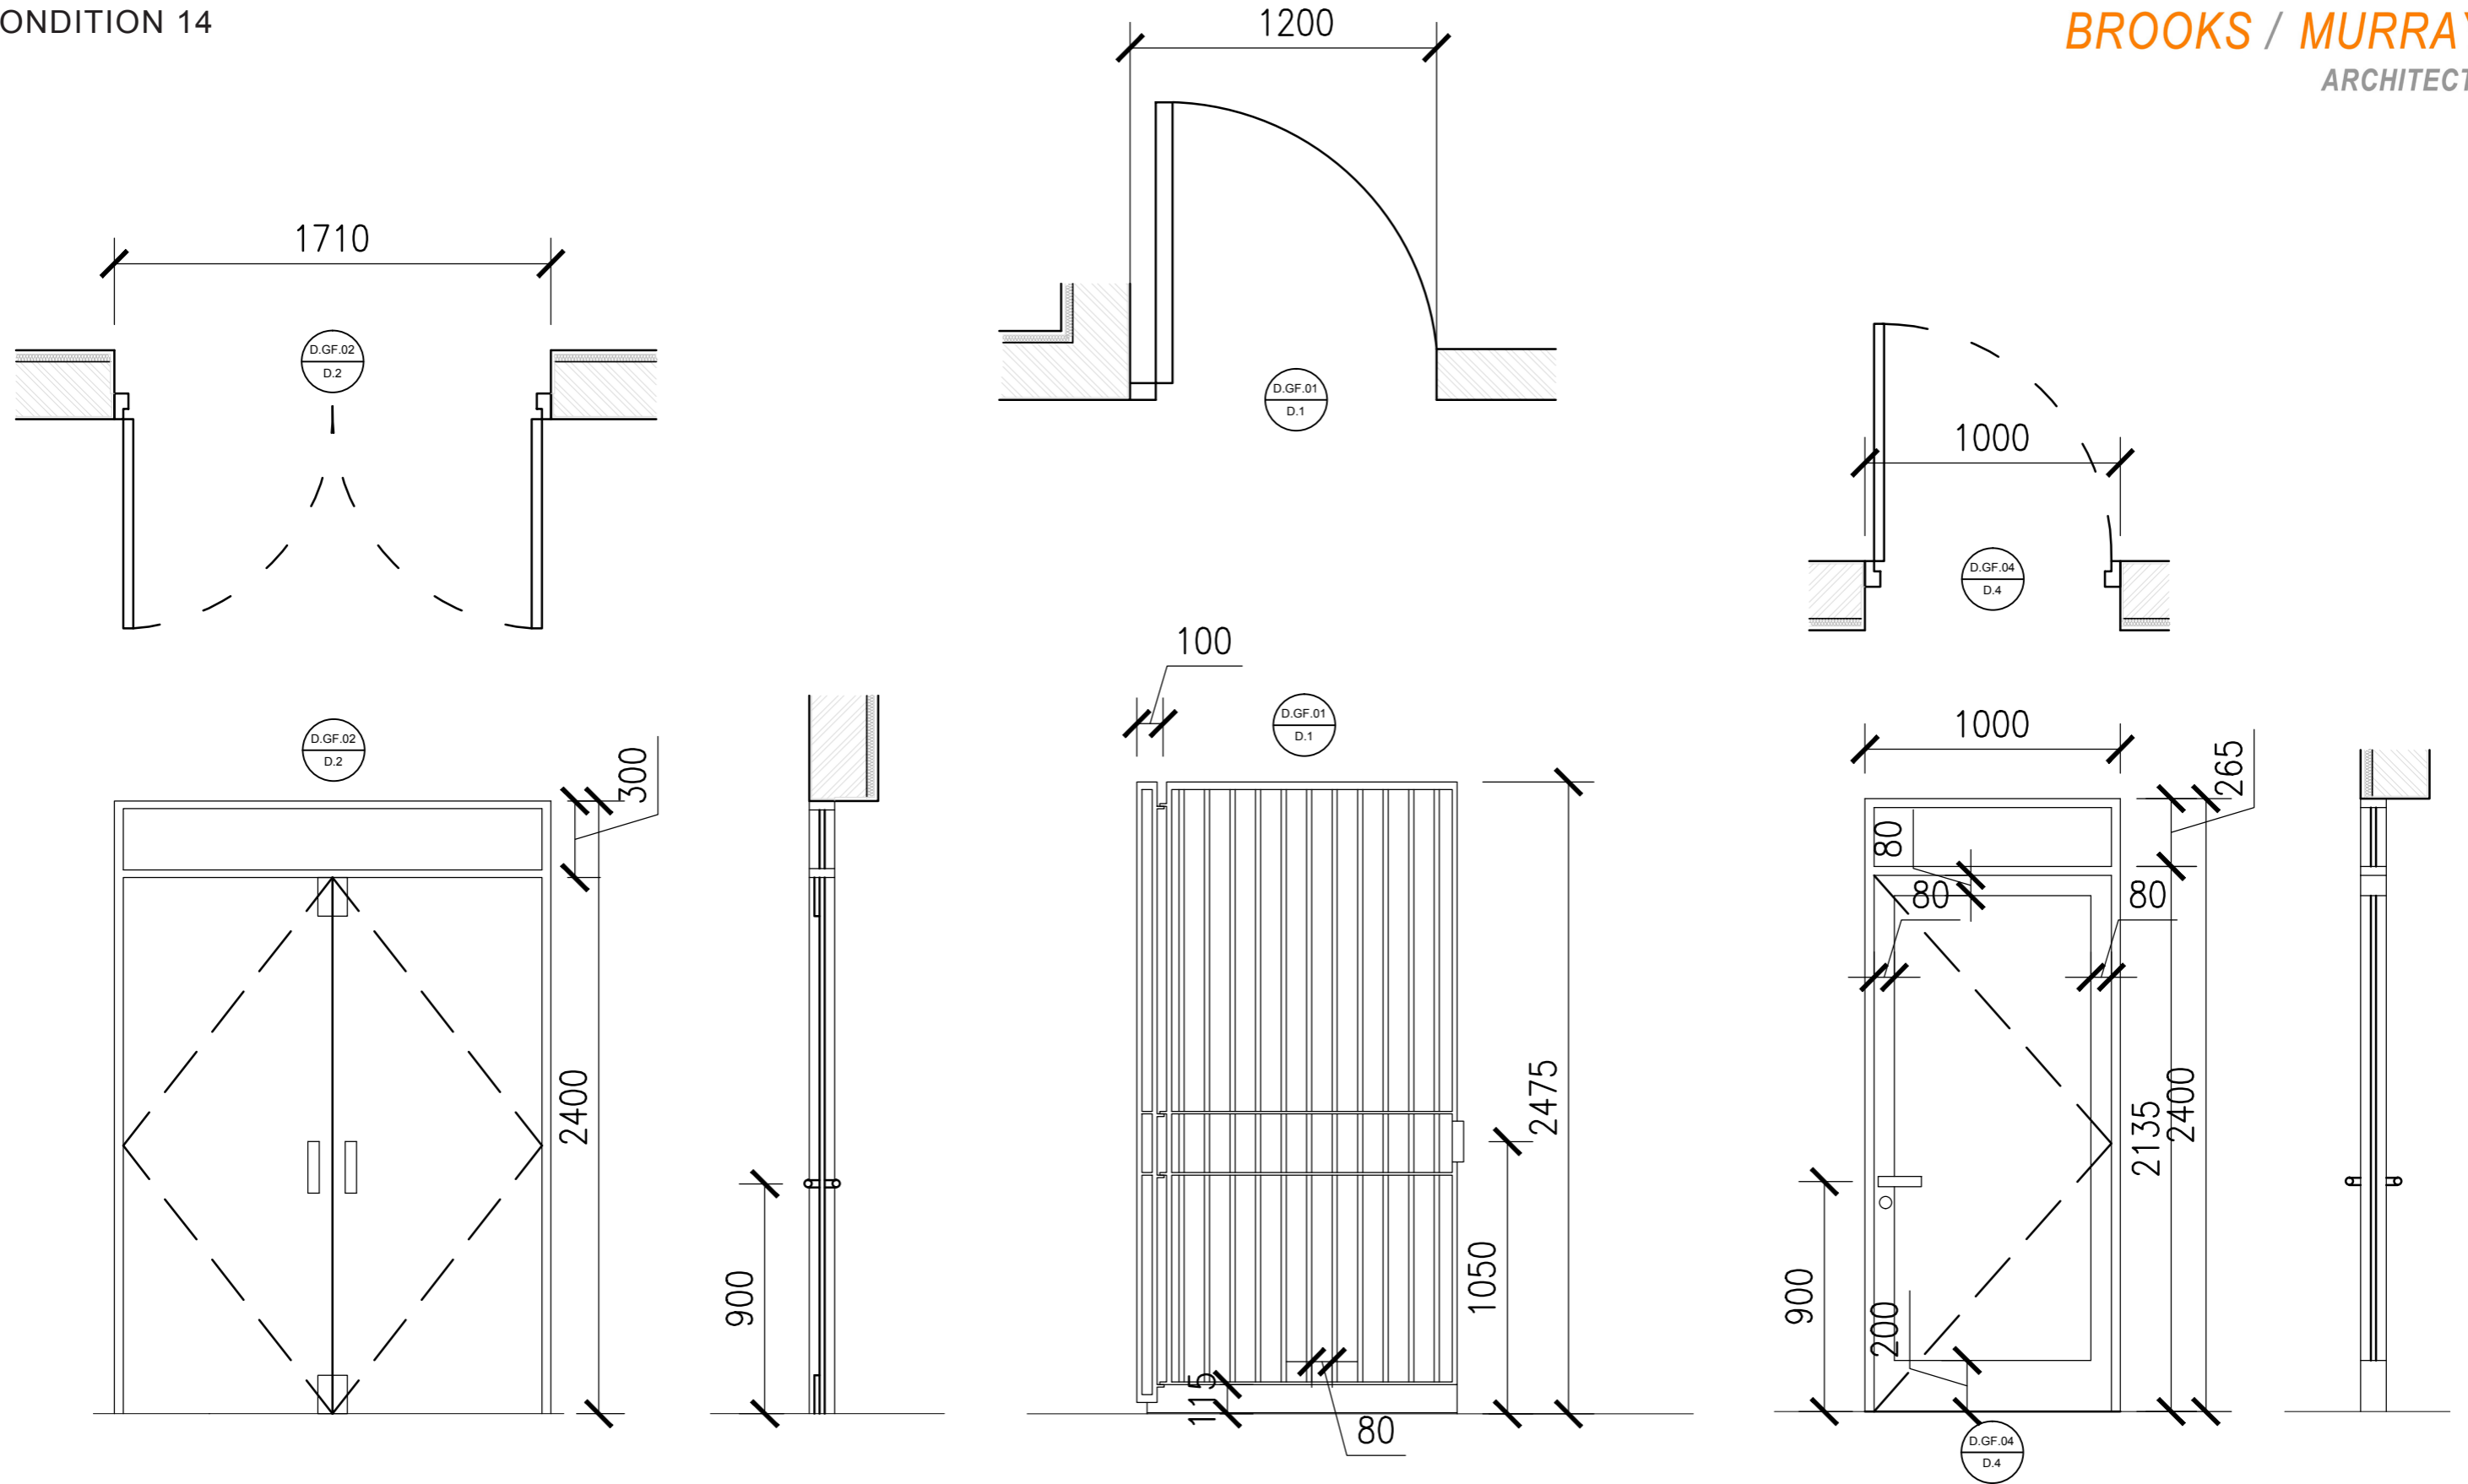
Plan, elevation and section of front and side entrance door to the employment space and security gate
